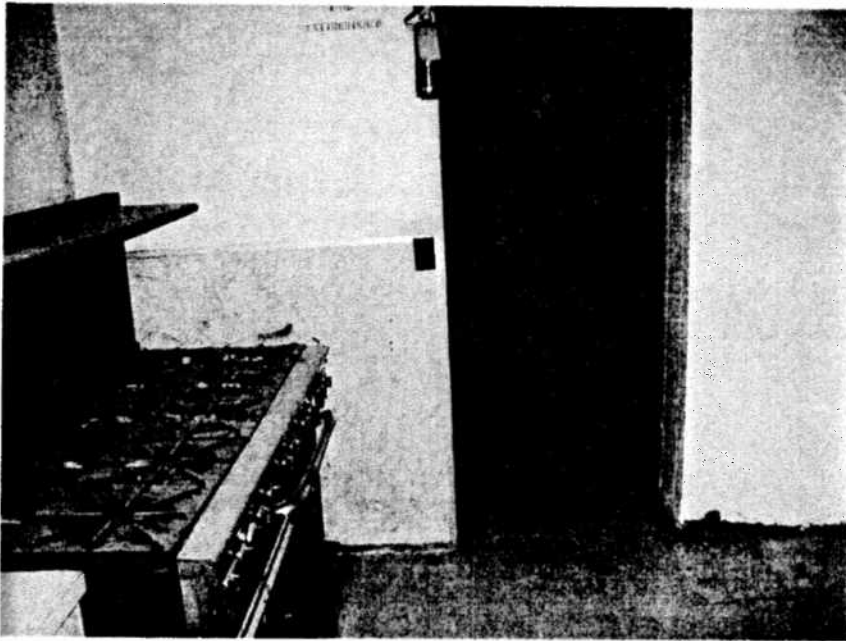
Kitchen area of mess hall showing 12" x 12" floor tile.
